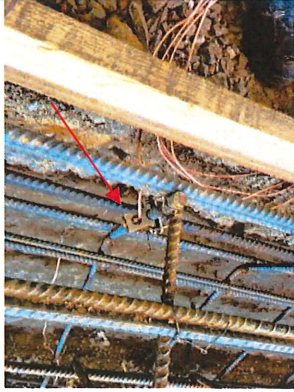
One end of a bare copper conductor #8 AWG bonded to Competition Pool shell (wall) reinforcing steel bar with a mechanical clamp/connector.
